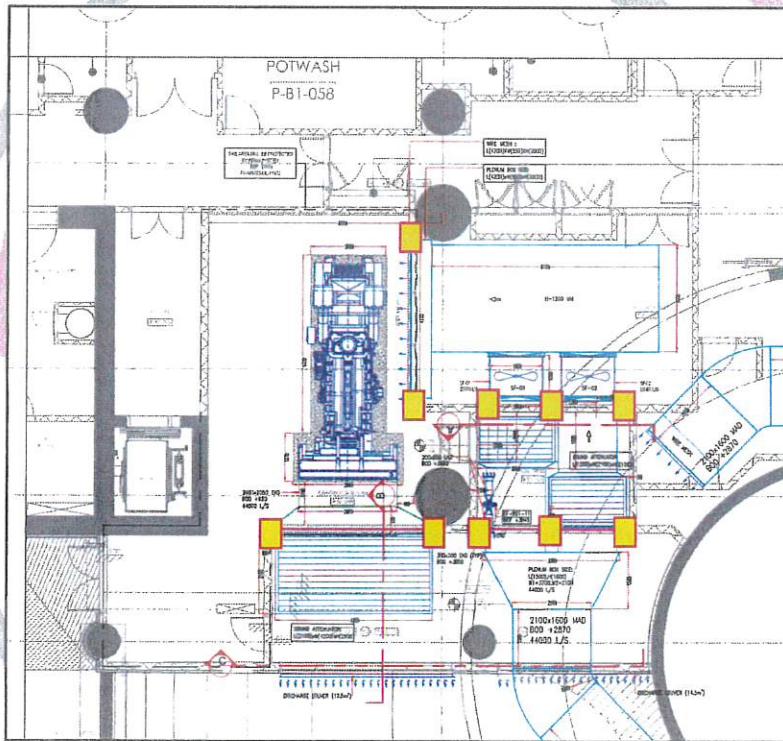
GENERATOR LAYOUT MARKED WITH SEALANT RECOMMENDATIONS
